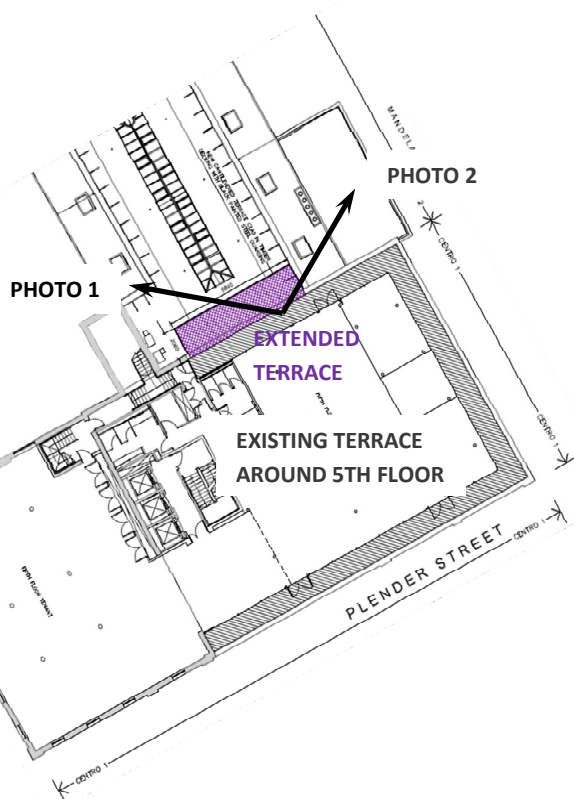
Plan of 5th floor showing the existing and the proposed extended terrace
